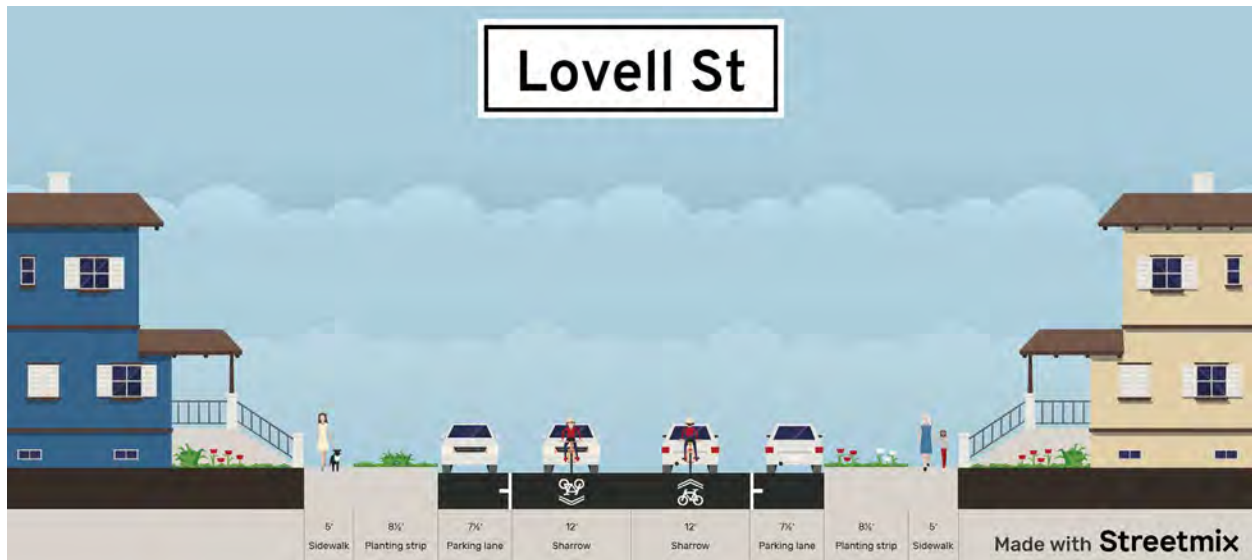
Lovell Street between Westnedge Avenue and Davis Street
